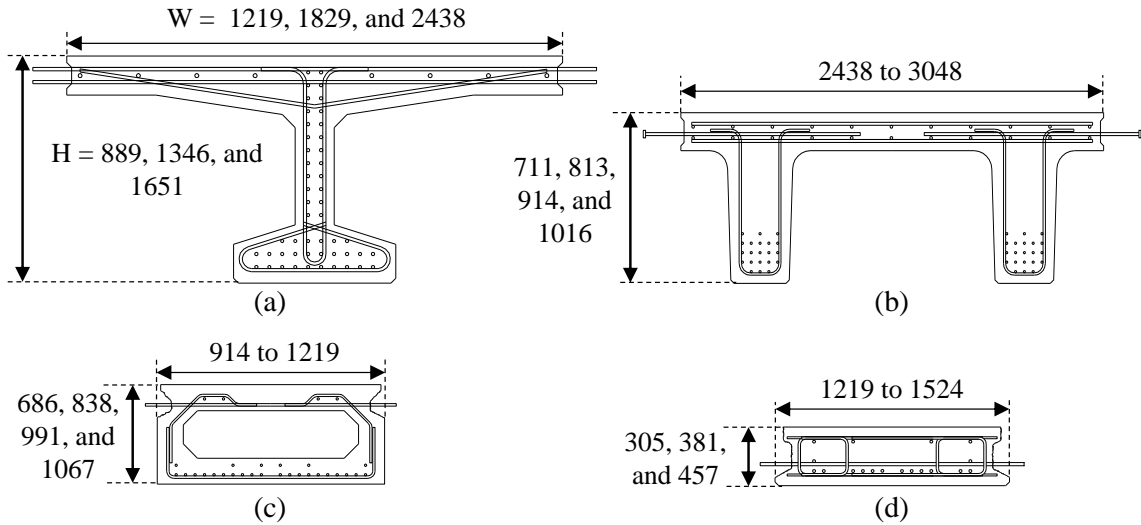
Selected bridge shapes with available widths (W) and depths (H): (a) Northeast DBT beam, (b) NEXT D beam, (c) AASHTO BI for ABC, and (d) Florida Slab Beam for ABC (units: mm, 1 mm = 0.0394 in.)
